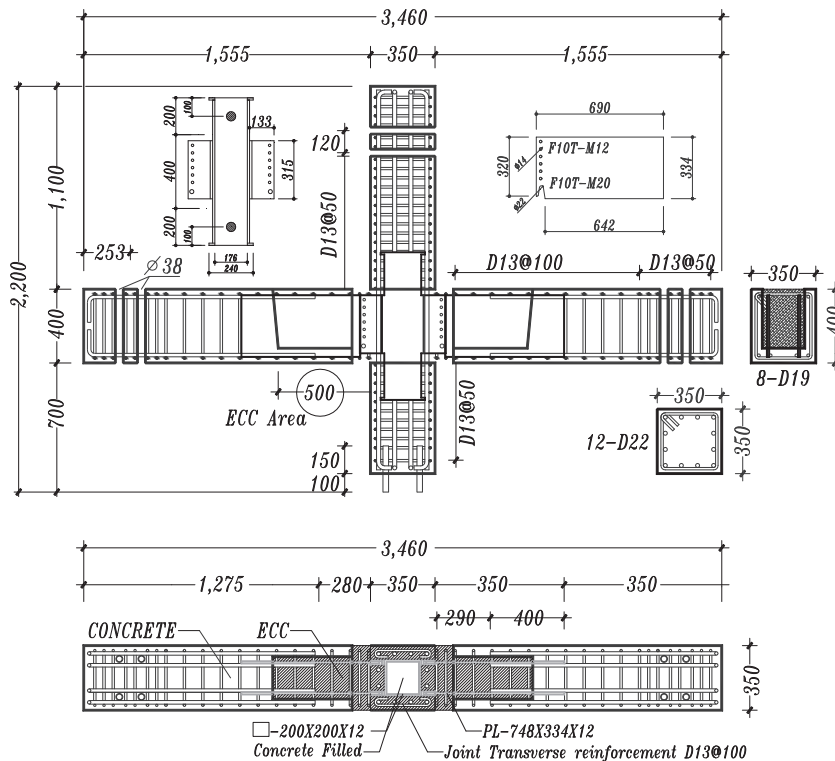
Details of PC-OH-50 Specimen (Unit: mm).
